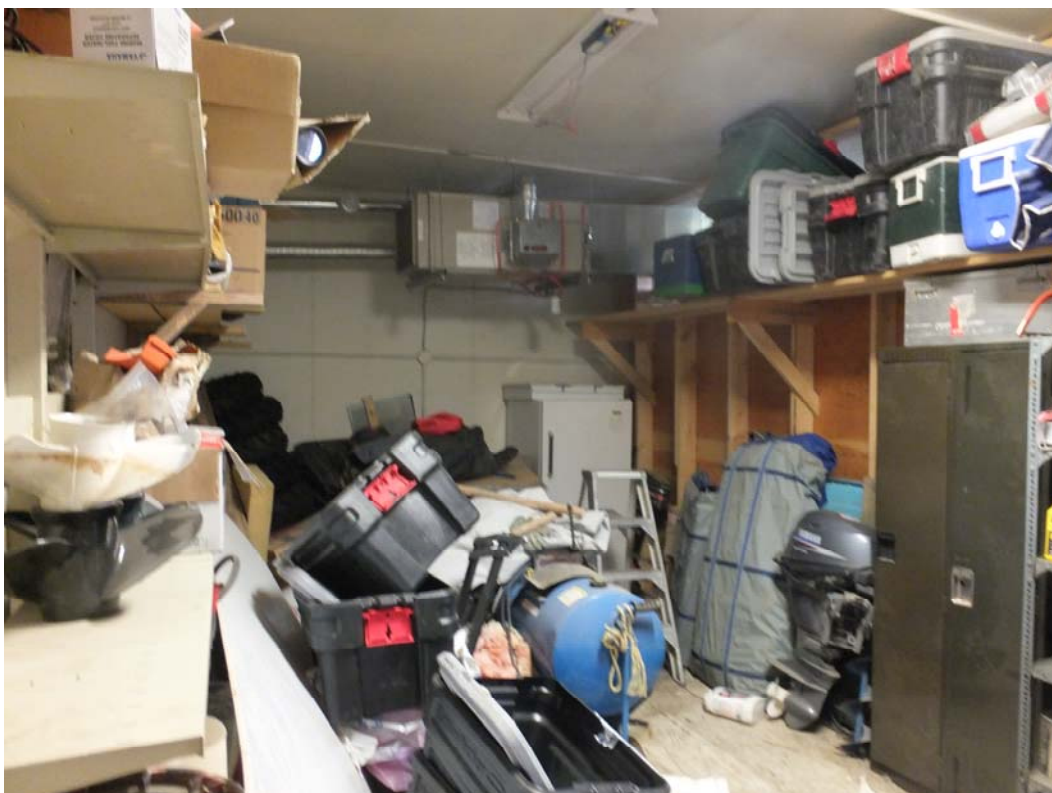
Inside of garage bay 1 facing east, note the ceiling mounted heater and associated ductwork, also the exposed light ballast and the freezer in the back corner.
